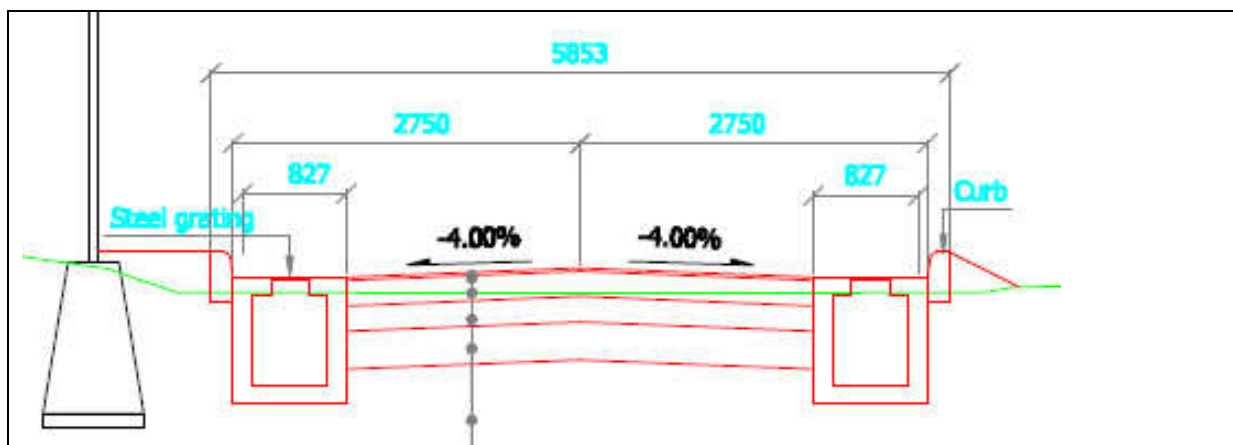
Updated design for cross-section of access road, Road 6 and Road 12
